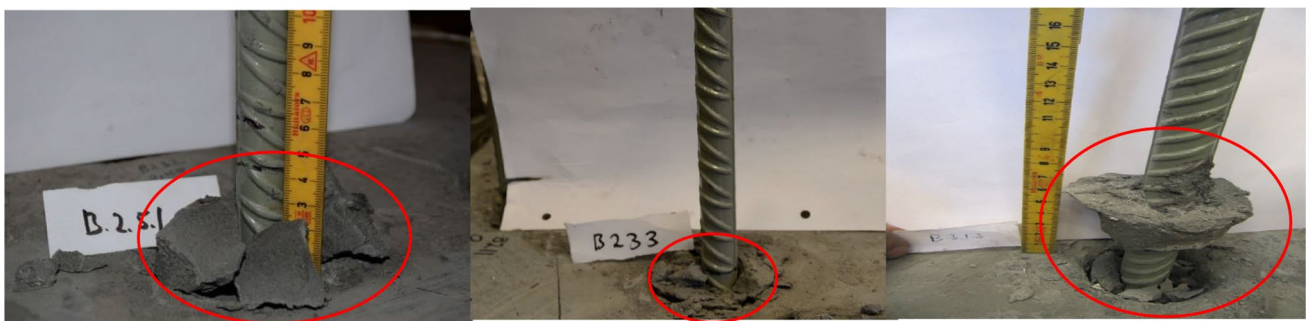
Concrete fracture occurrence in the bolt pullout test
